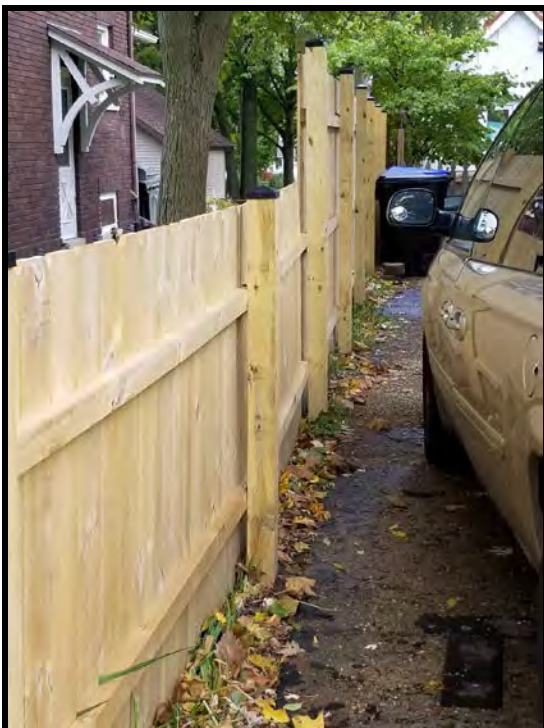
Fence at driveway of neighbor at 915 W. Wood Street.
